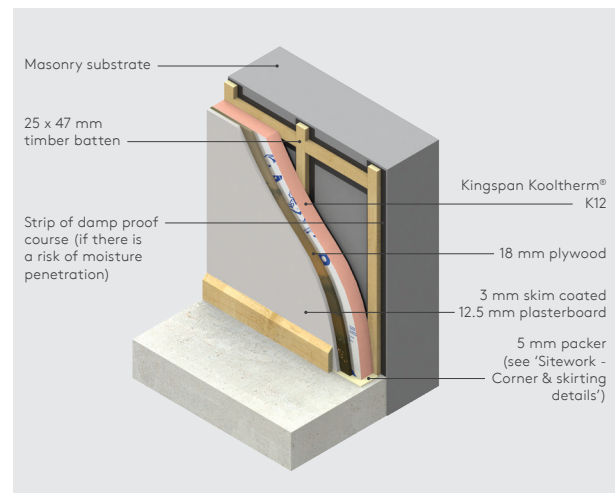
Mechanically fixed construction suitable for heavy internal fittings
